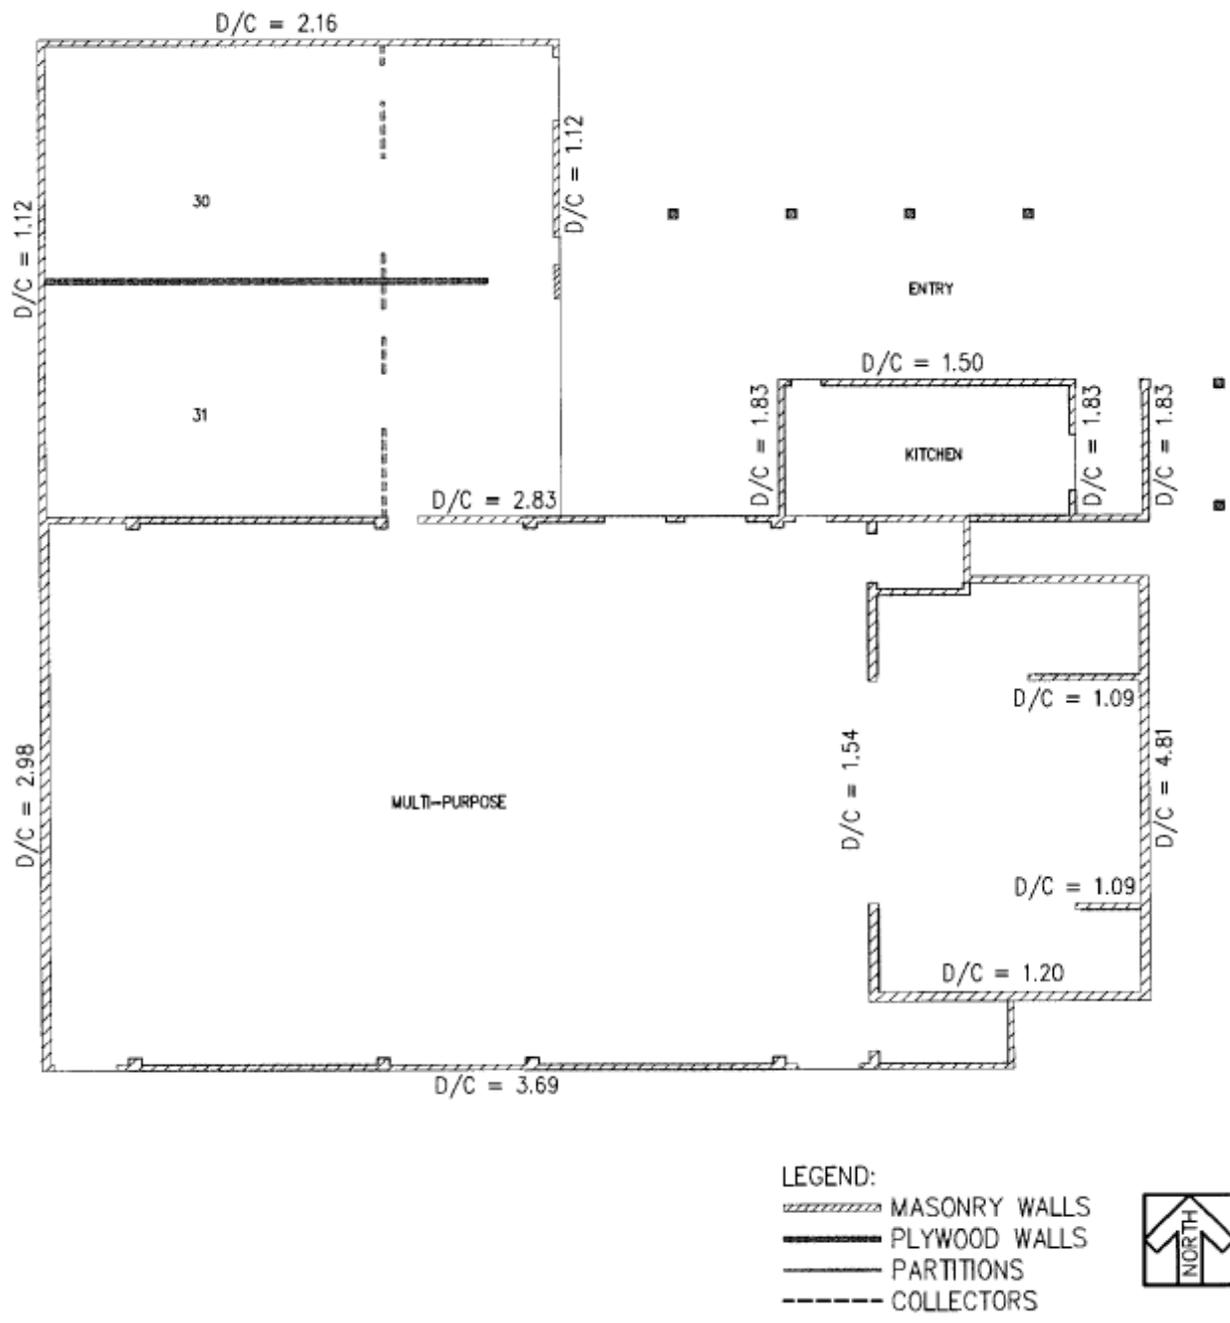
Building B demand-to-capacity ratios (D/C) for anchorage of the walls to the roof for out-of-plane seismic forces.
